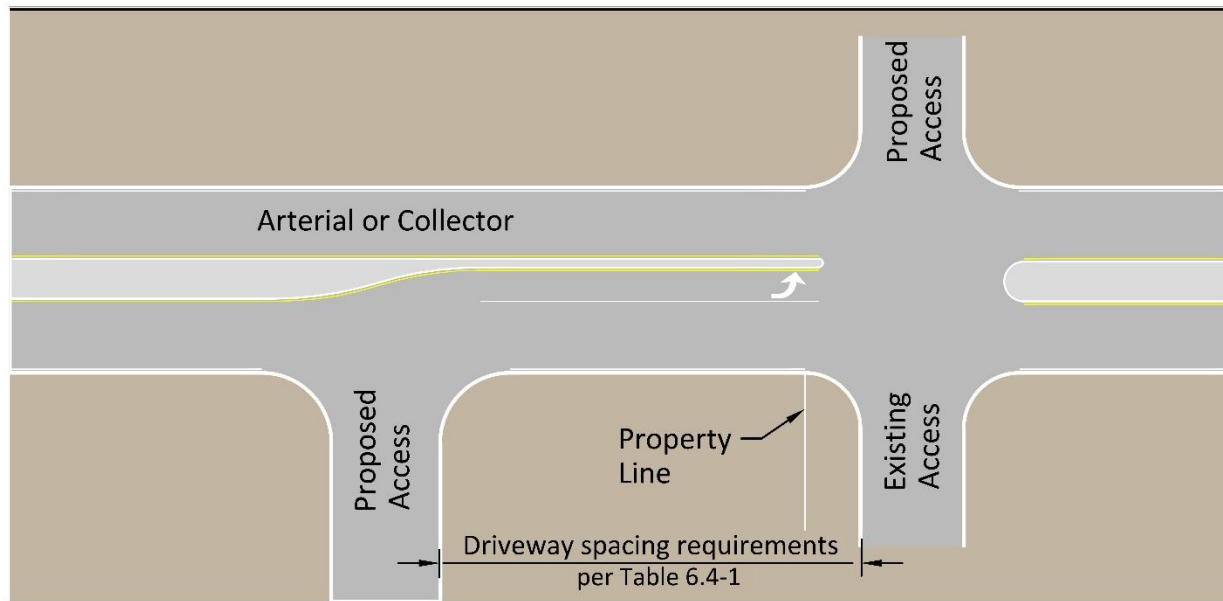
Divided Roadway, 150' Offset Driveway Locations – Median Opening
